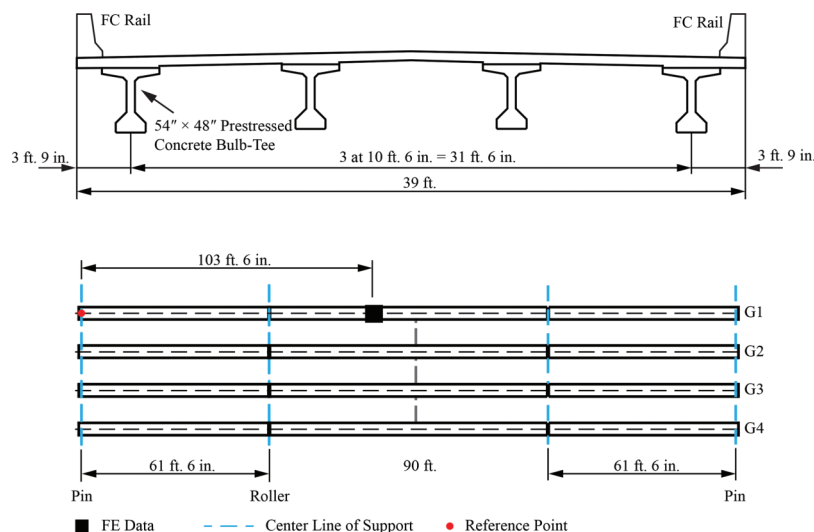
Cross-section and frame plan of the modified three-span continuous prestress girder bridge.
